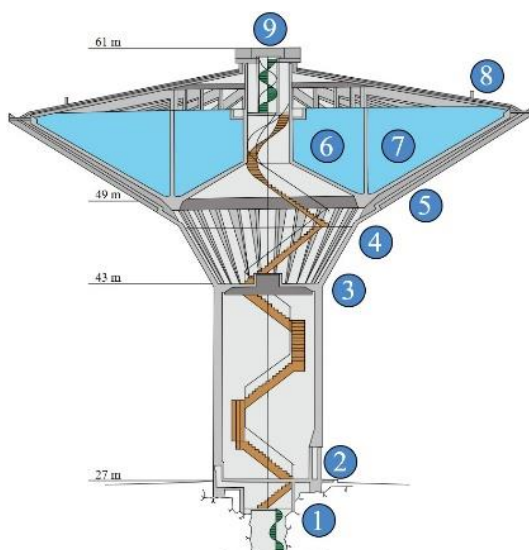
Cross-section of the Lauttasaari water tower: 1-shaft and stairs to the water tunnel; 2-front door; 3-central opening for supply lifting; 4-central room and support beams; 5-support ring; 6-inner water container; 7-outer water container; 8-air-conditioning pipes; 9-roof platform.
